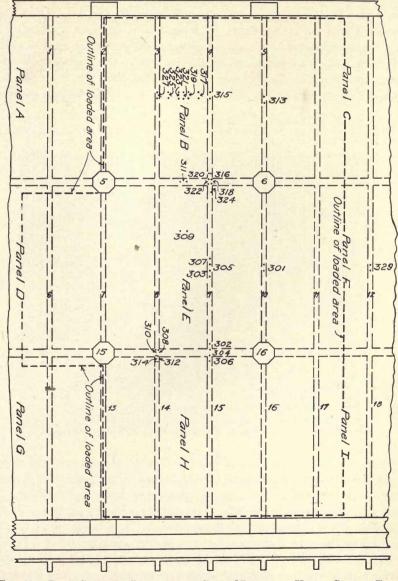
PLAN SHOWING LOCATION OF GAUGE LINES ON UPPER SIDE OF FLOOR.
